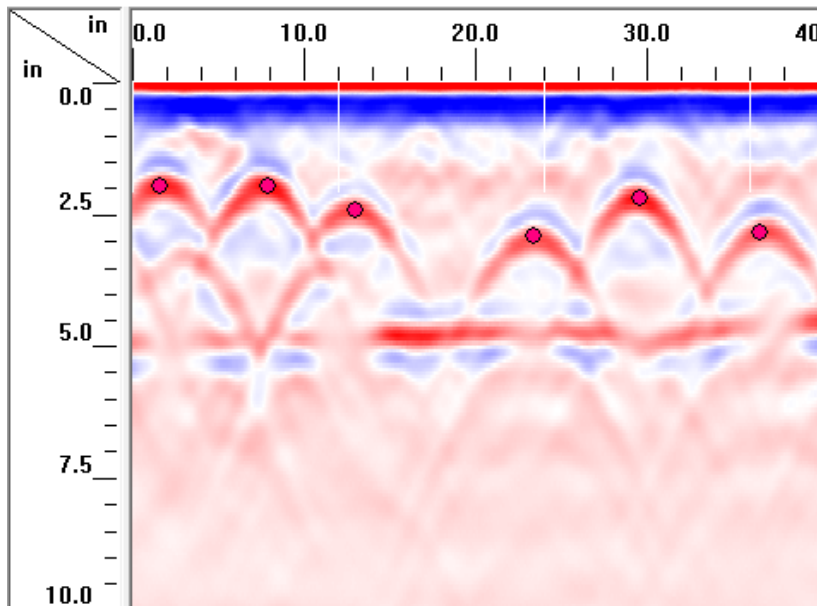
Example recorded scan of reinforcement in bent column, with red markers indicating cover depths to reinforcement.
